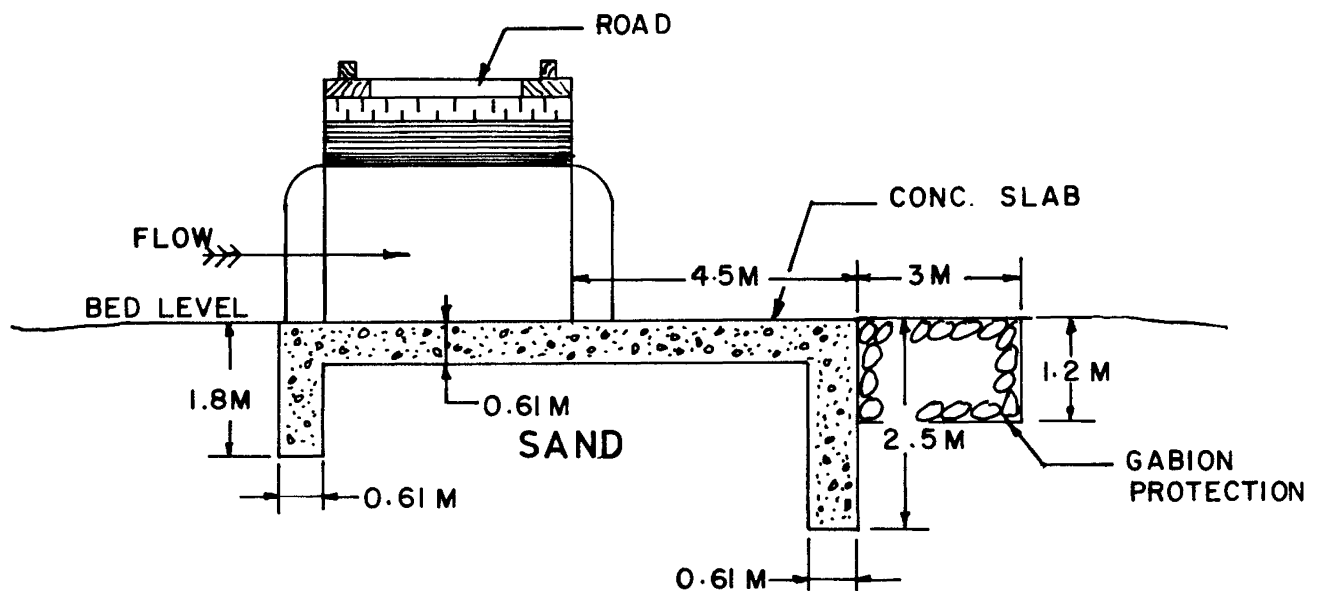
A SKETCH OF EXTENDED CONCRETE SLAB
